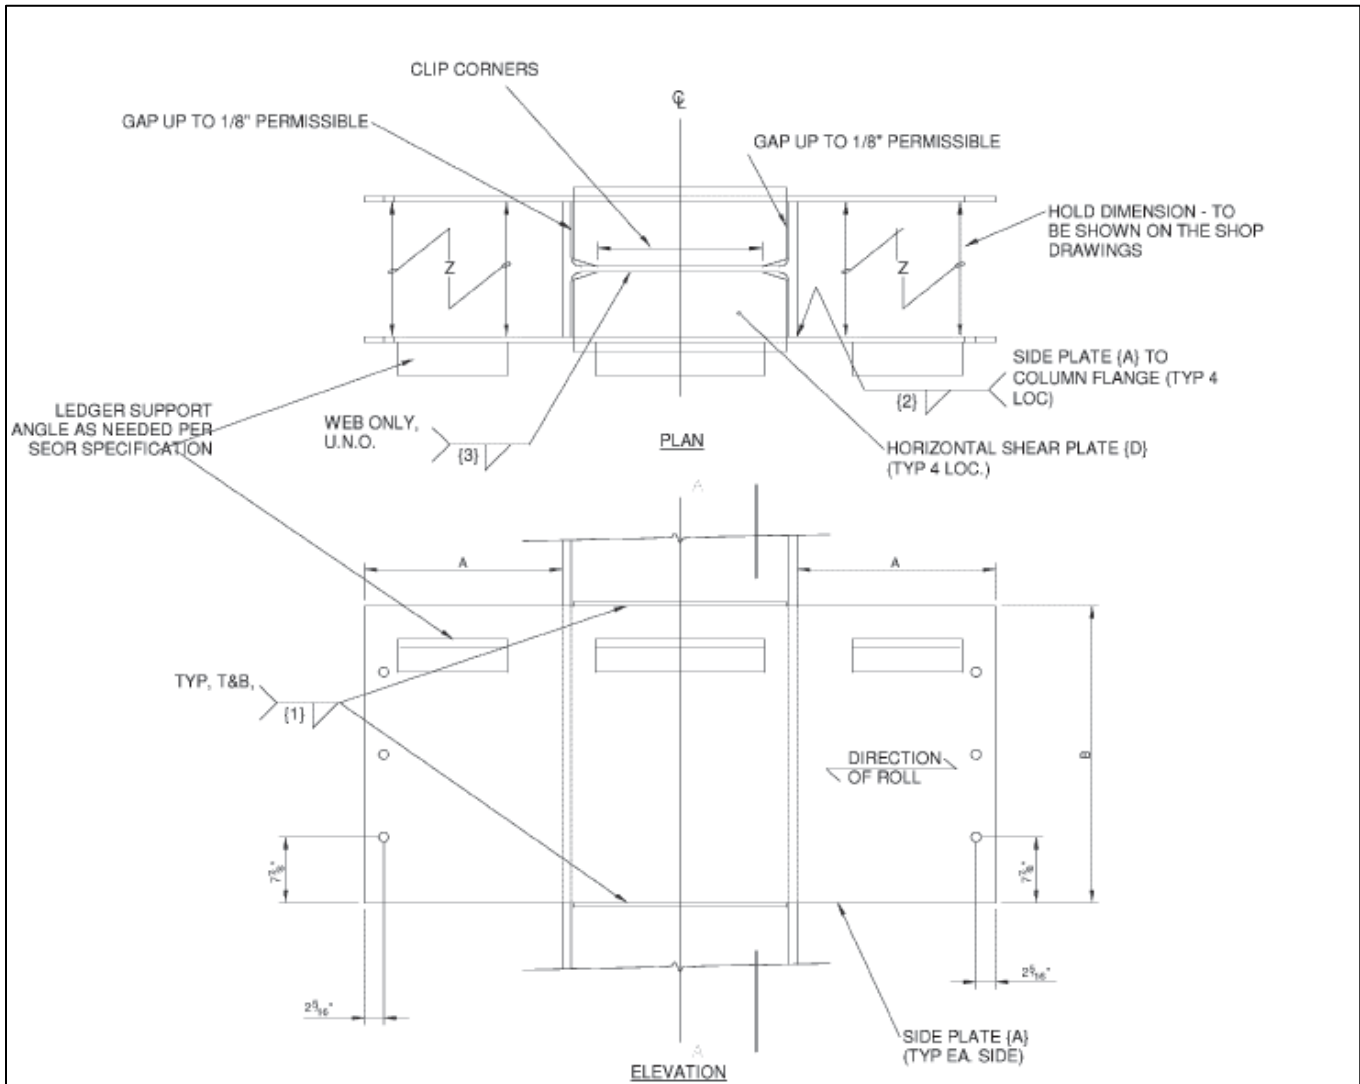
Elevation and plan view of a SidePlate Frame System. Image courtesy of Ellerbe Becket.
